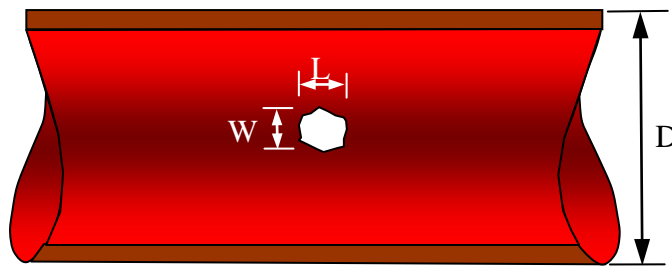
Schematic Drawing of Local Loss of Pipe Wall
